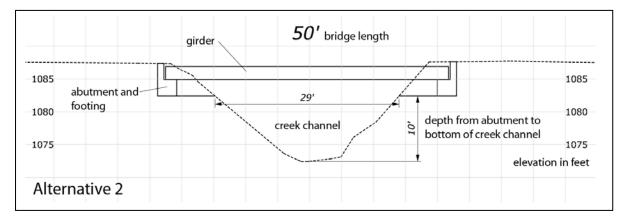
Alternative 2 (Preferred Alternative) Location Plan and Bridge Cross-section
